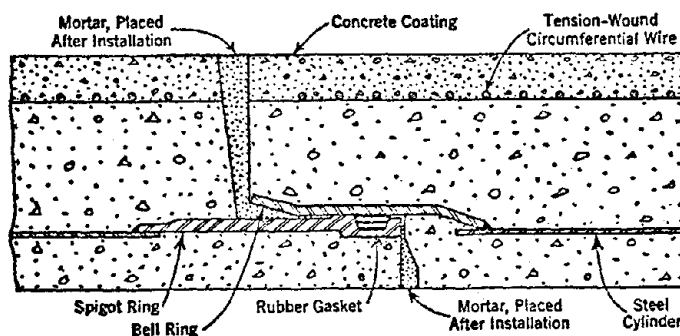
Embedded-Cylinder Prestressed Concrete Pipe and Joint PCEC
